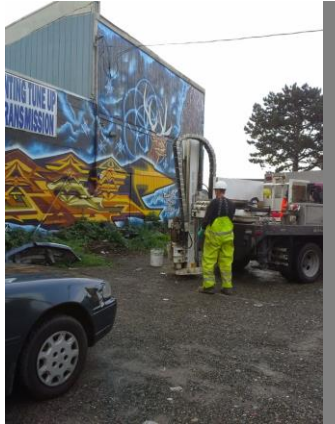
Boring B-1 being advanced. Photo looking southwest.
